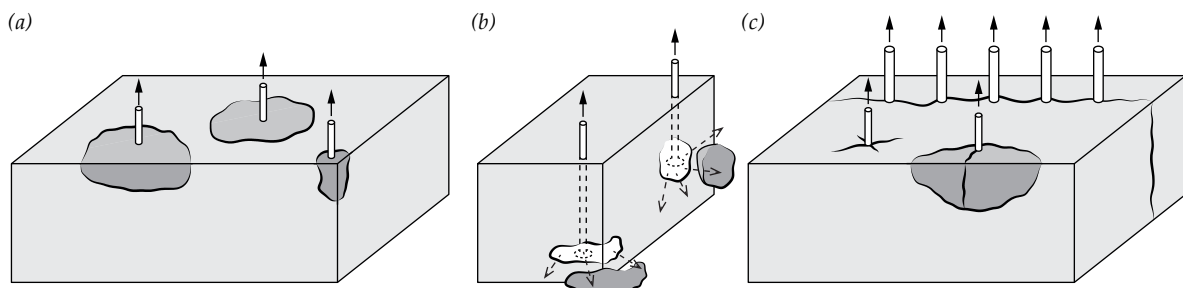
Main possible failure modes associated with tension loading of reinforcing details such as headed bars in concrete elements (adapted from [Eli06]): (a) concrete-cone breakout; (b) lateral blow-up; and (c) splitting
